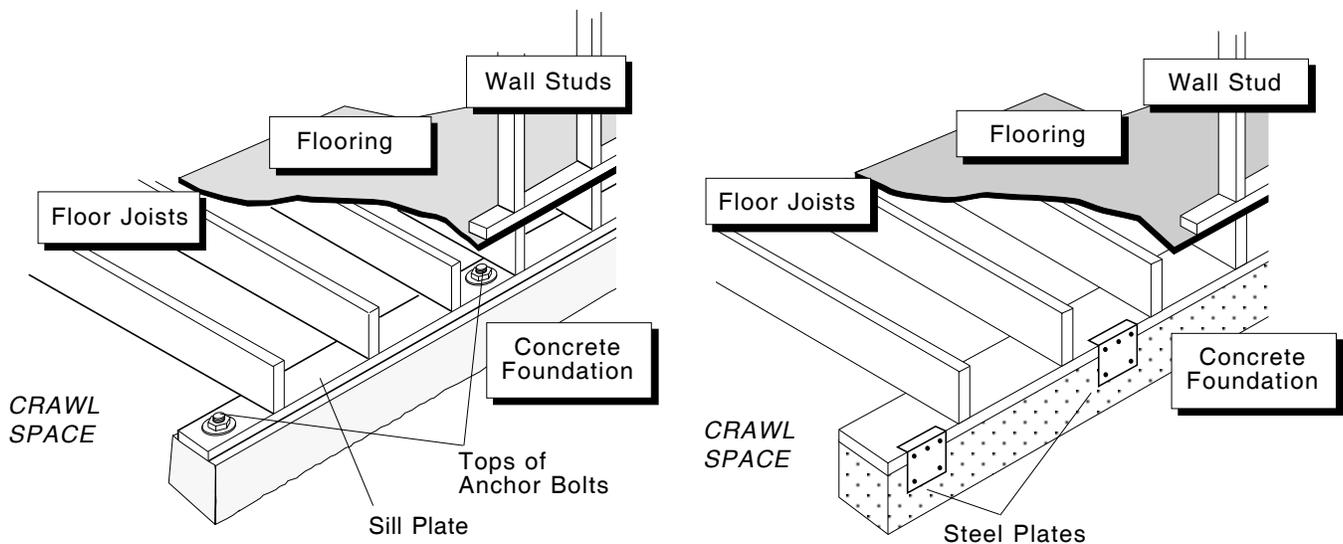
Anchor bolts or steel plates. A home's crawl space may be formed by a cripple wall between the foundation and the floor joists (as illustrated in figure 3, page 5) or the floor joists may rest directly on the sill plate. In either case, you should be able to see the heads of anchor bolts or steel plates installed every 4 to 6 feet (not necessarily exactly as shown here). These fixtures fasten the sill plate to the foundation.
